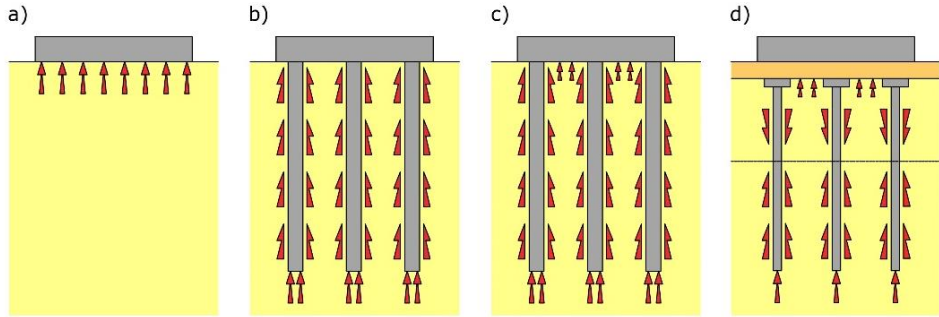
Various types of foundations: a) slab foundation, b) pile foundation, c) slab-pile foundation, d) soil reinforcement with concrete columns (based on [1])
